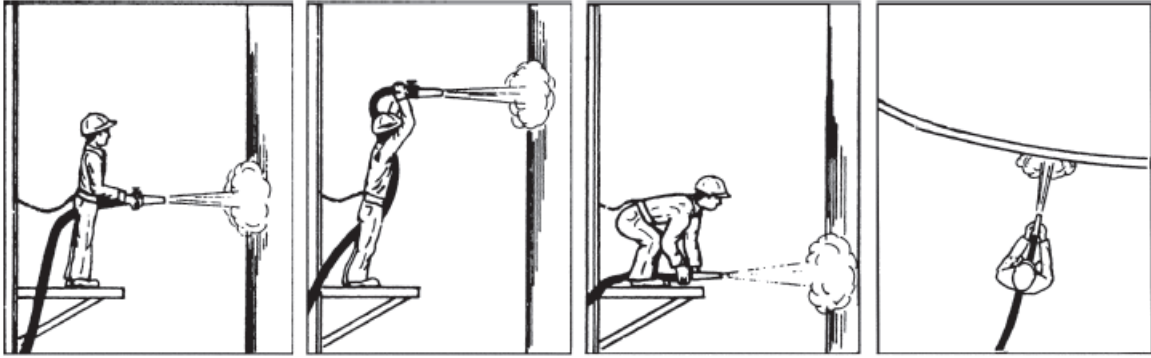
Correct shooting positions (ACI 506r-16)
